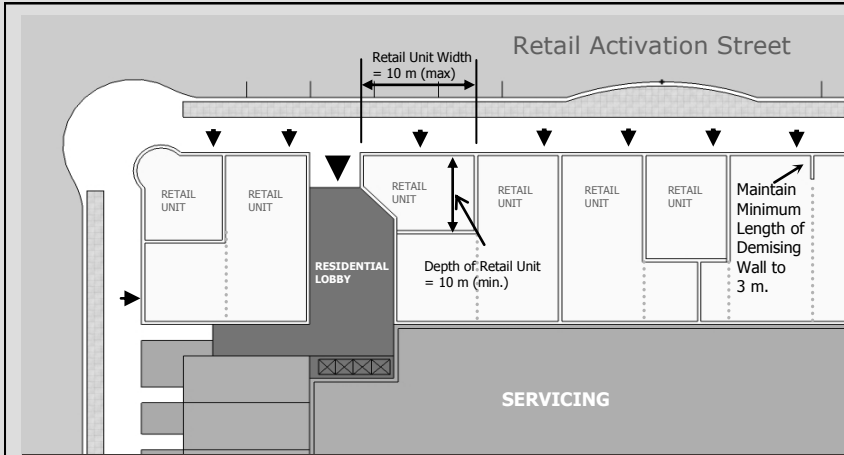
Interior demising walls for retail units can be configured to promote an expression of narrower units and smaller retail spaces along building frontages, opening up beyond to combine units into larger retail spaces.
